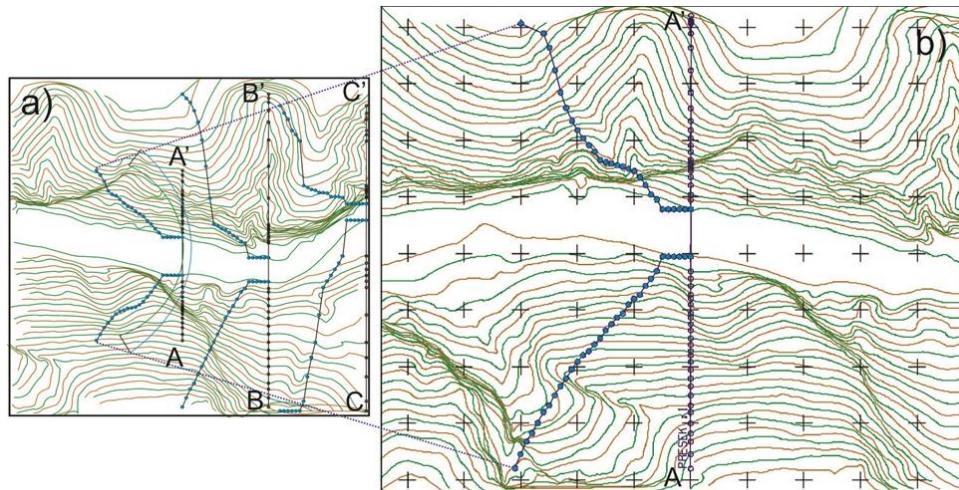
Selection of optimal dam location: a) potential locations (straight lines) and respective cross section profiles (overturned projections) of the dam foundation, and b) final location of the dam (cross section A-A').
